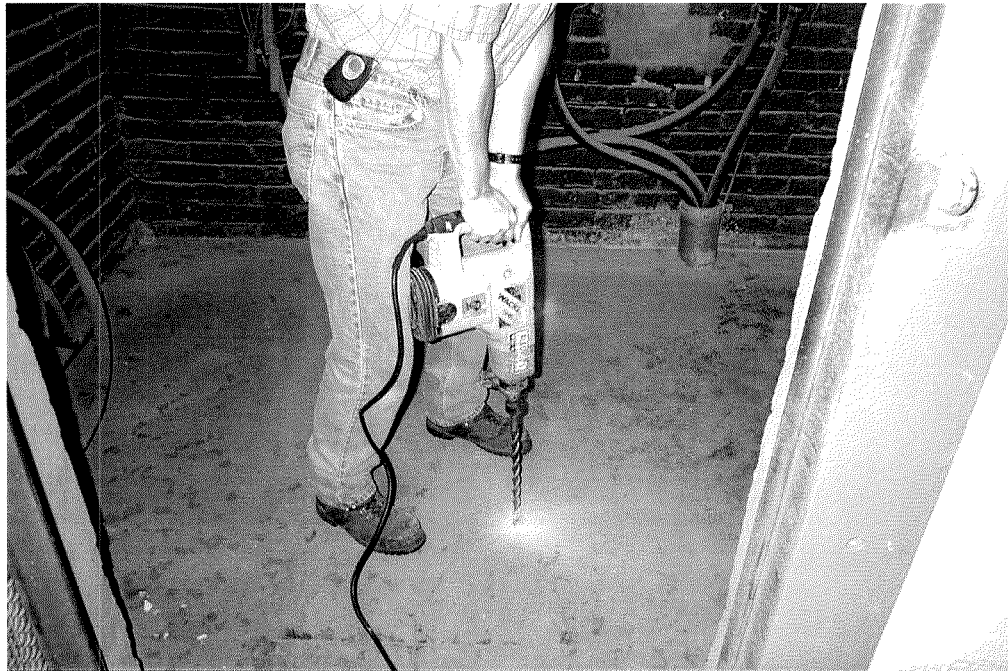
View of electrical cable room in 5 th wing of sub basement. Composite concrete sample taken from floor.
